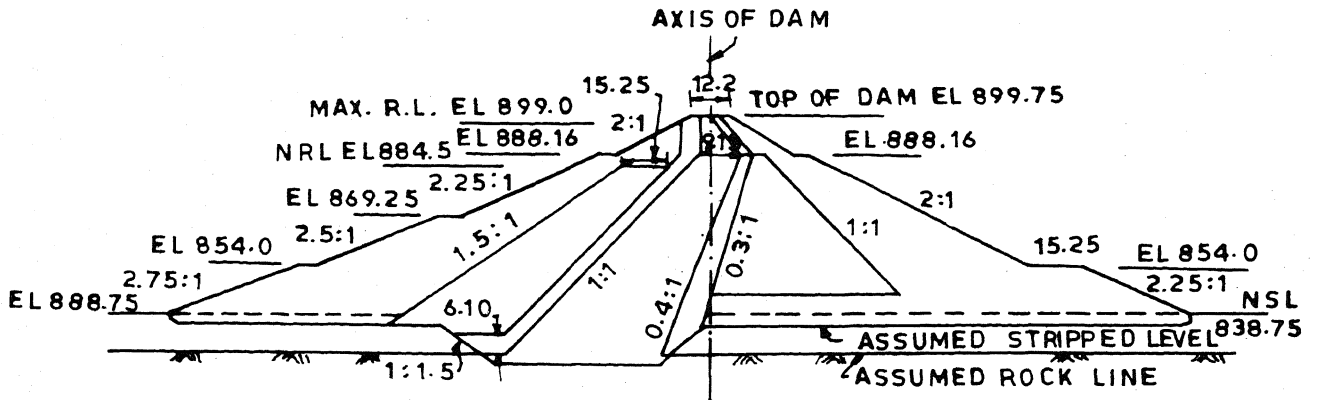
ROCKFILL DAM AT PANDOH PROPOSED ORIGINAL SECTION
